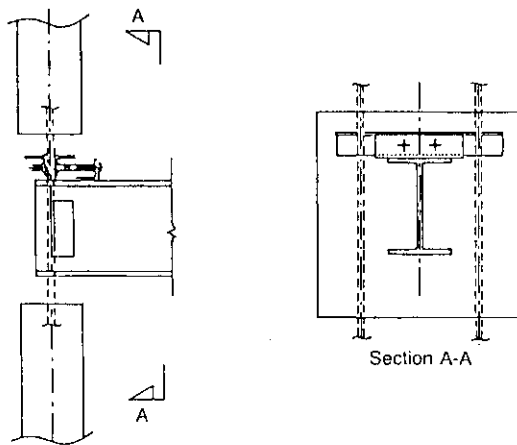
Detail for attachment of steel beam to concrete core.
